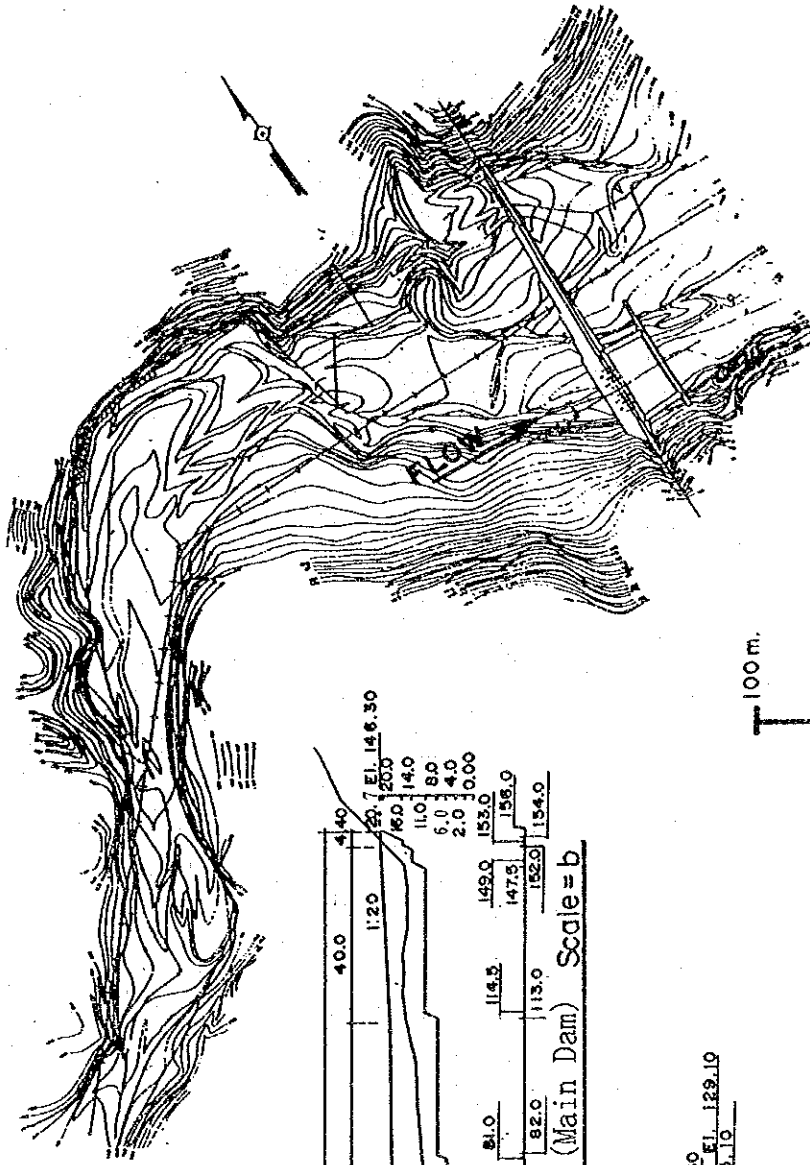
PROPOSED CHECK DAM NO. 1 (MAJAJNE DAM)
